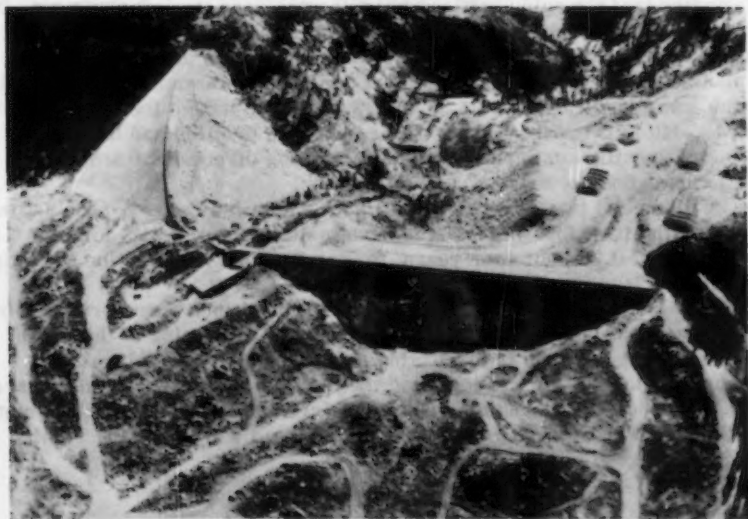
AERIAL VIEW OF COMPLETED DAMS PRIOR TO
